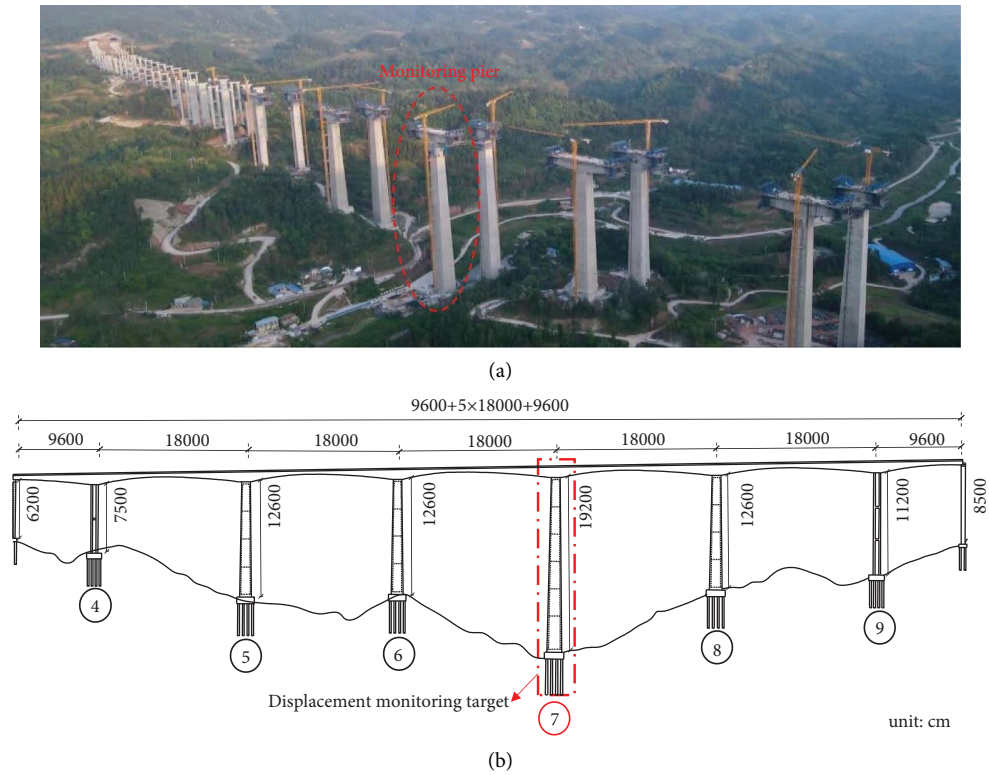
The studied Lugou river bridge: (a) panoramic view and (b) elevation view.
